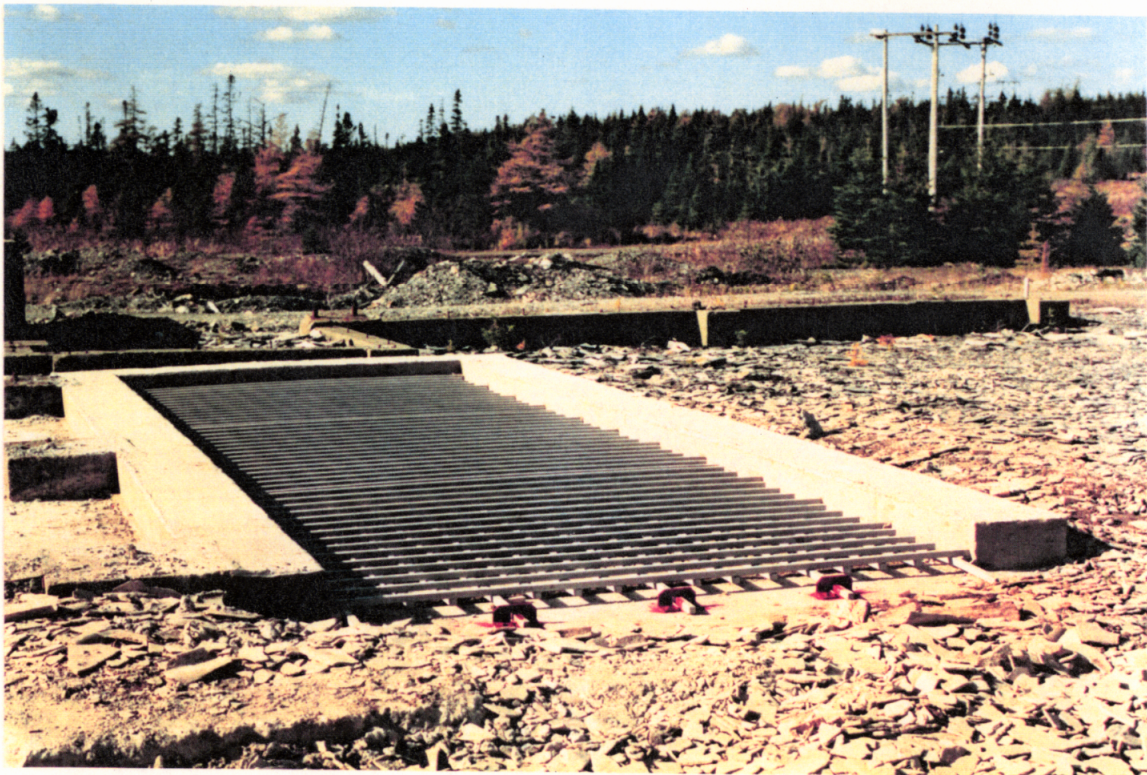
Completed concrete collar and steel grate over No. 2 Shaft showing steel anchor brackets.
